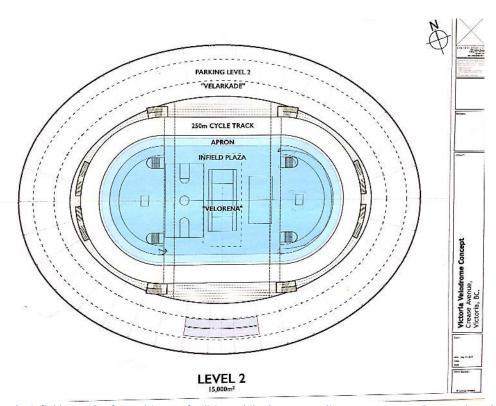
The infield provides for multi-sport facilities, while the surrounding superstructure houses the other amenities, both public and private. The infield can have a park like area with mobile planters with shrubs and picnic tables for building users and employees.
